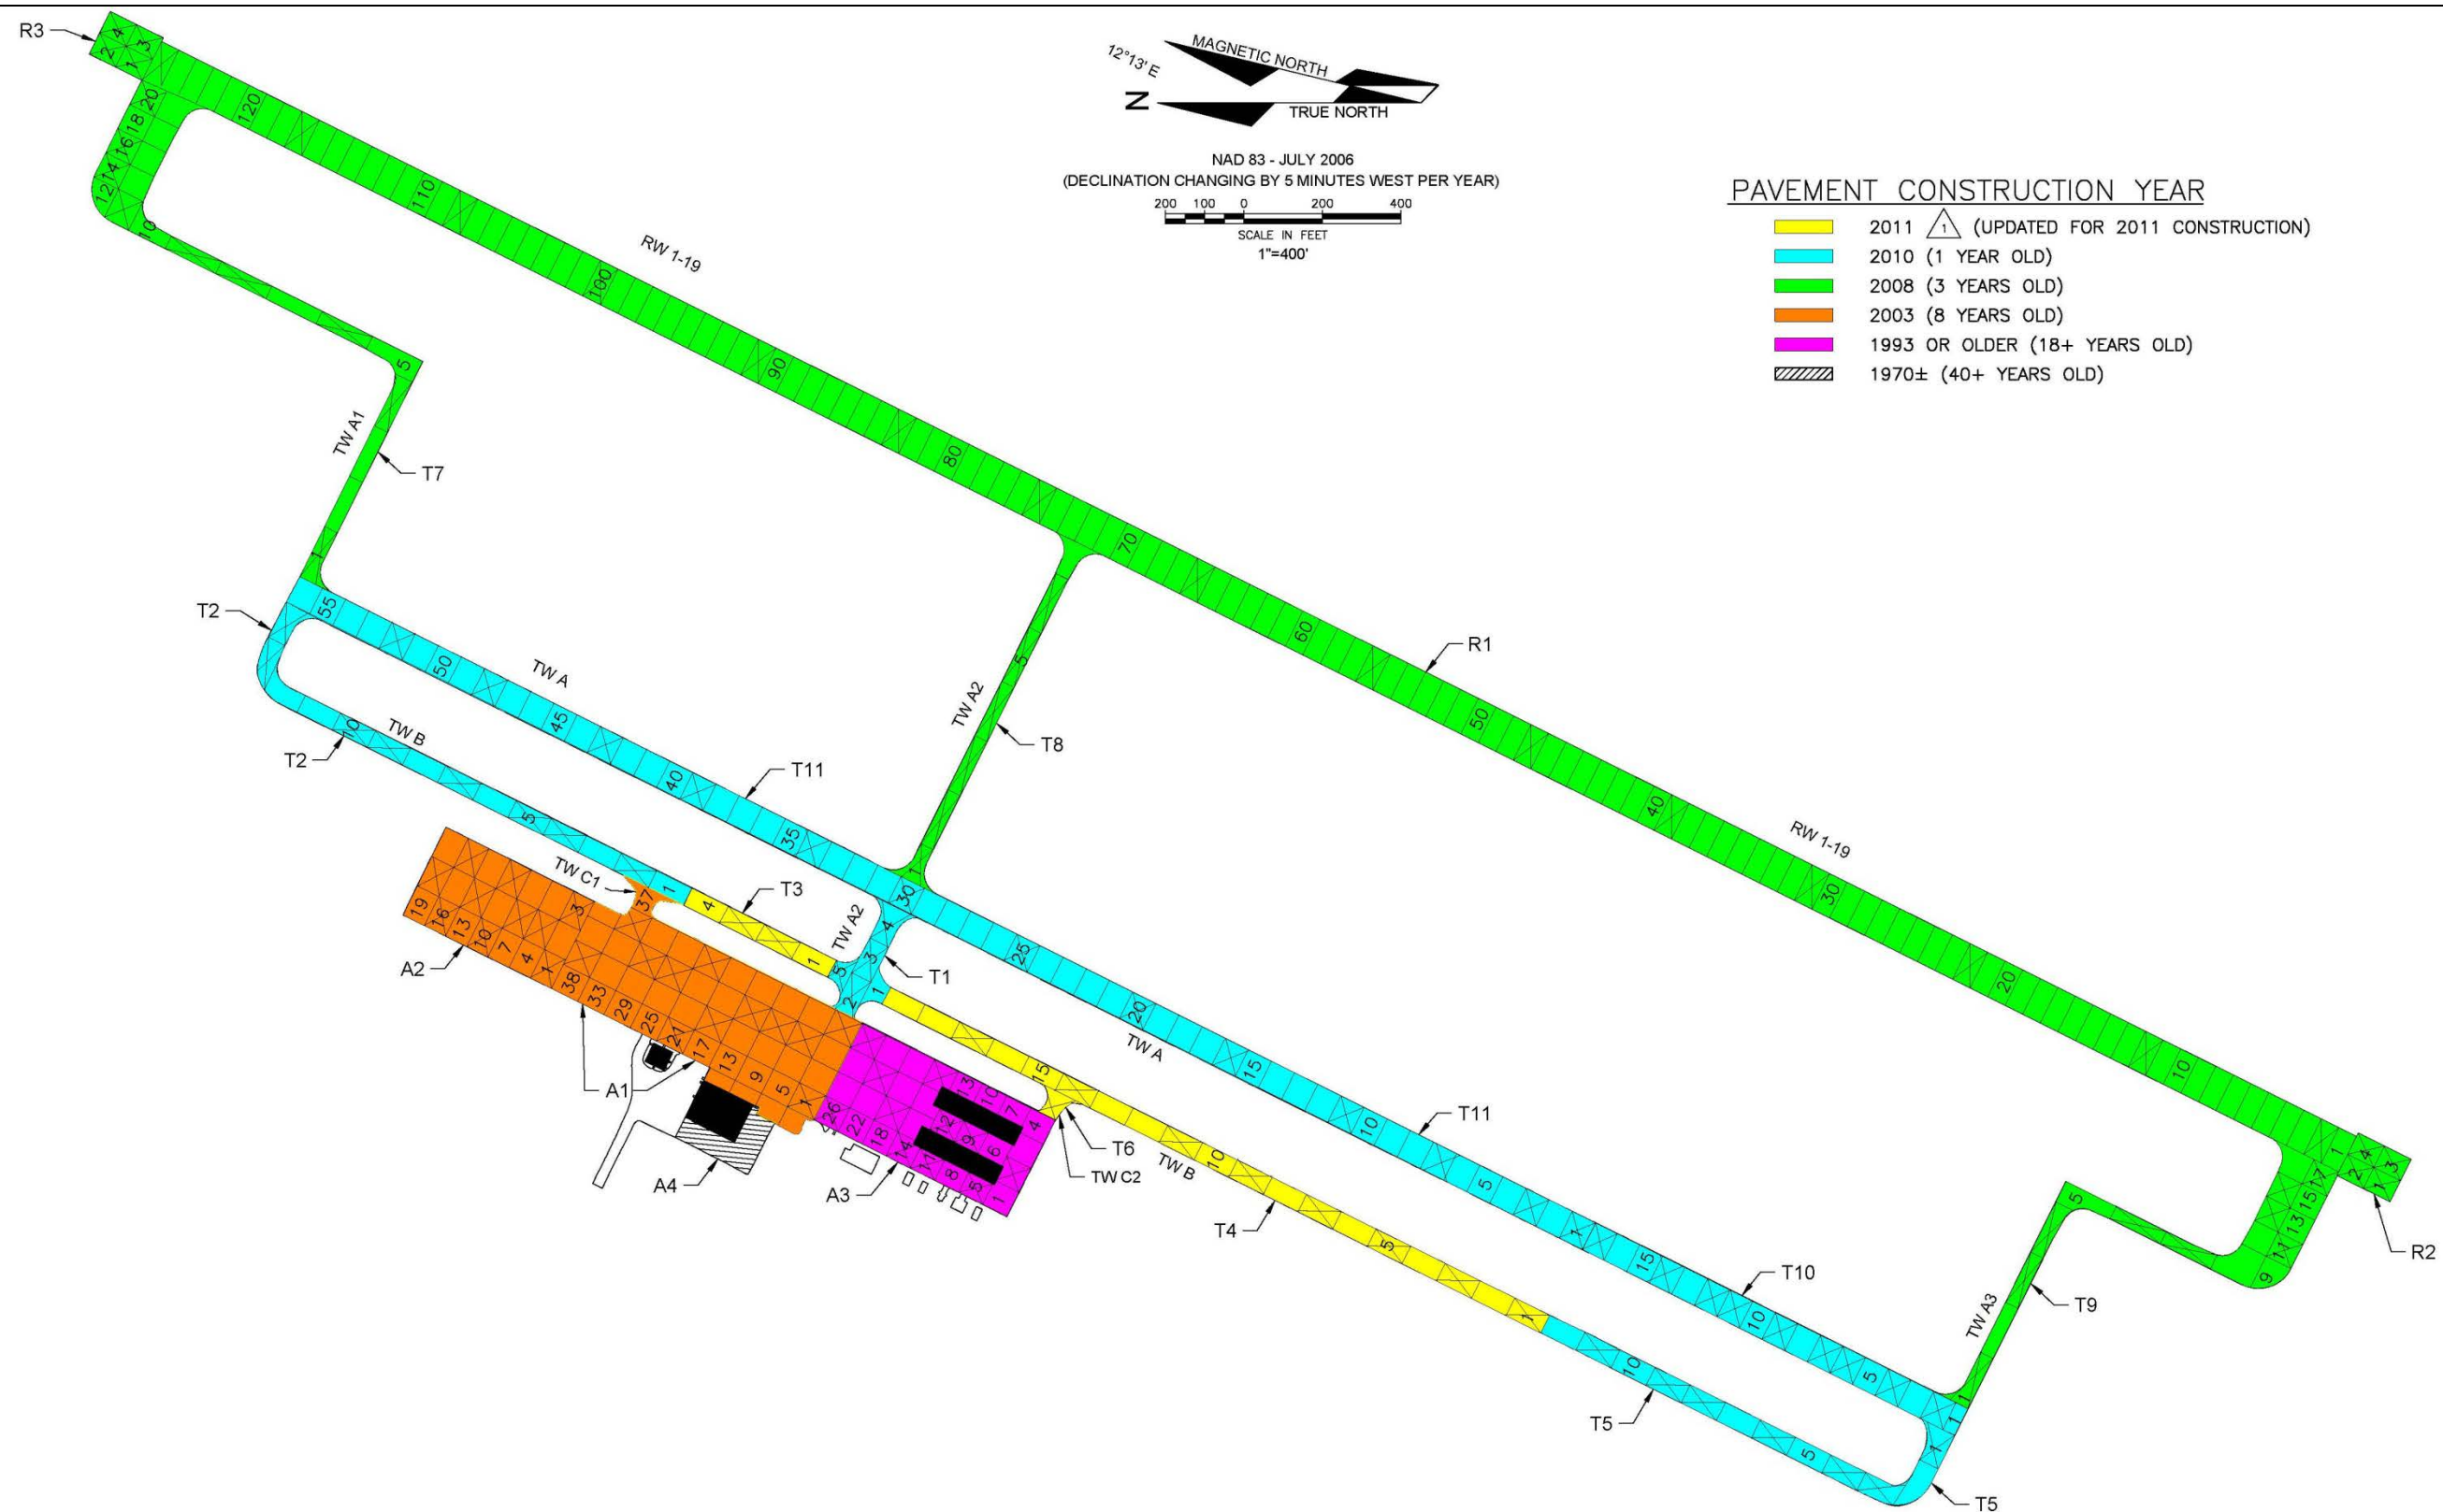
shows the strength of the airfield pavement by section. Figure 1-4 depicts the age of the various sections of pavement on the airfield by age. The oldest sections of pavement, the based aircraft apron and two portions of Taxiway B, are more than 20 years old, followed by the transient apron, which is currently 9 years old. The runway and portions of Taxiways A1, A2 and A3 between the Runway and Taxiway A were newly constructed in 2009. Taxiway A and the end portions of Taxiway B were reconstructed in 2010.
